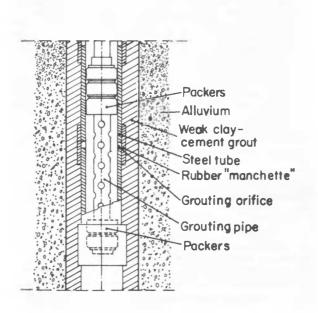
Essential Details of the Tube A' Manchettes Grouting Pipe
